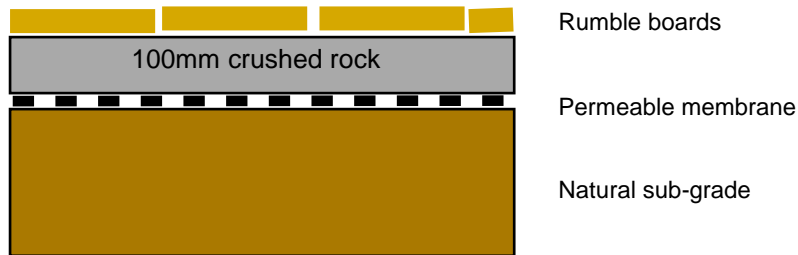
Indicative ground protection system - adapted from AS4970 Clause 4.5.3 Ground protection
